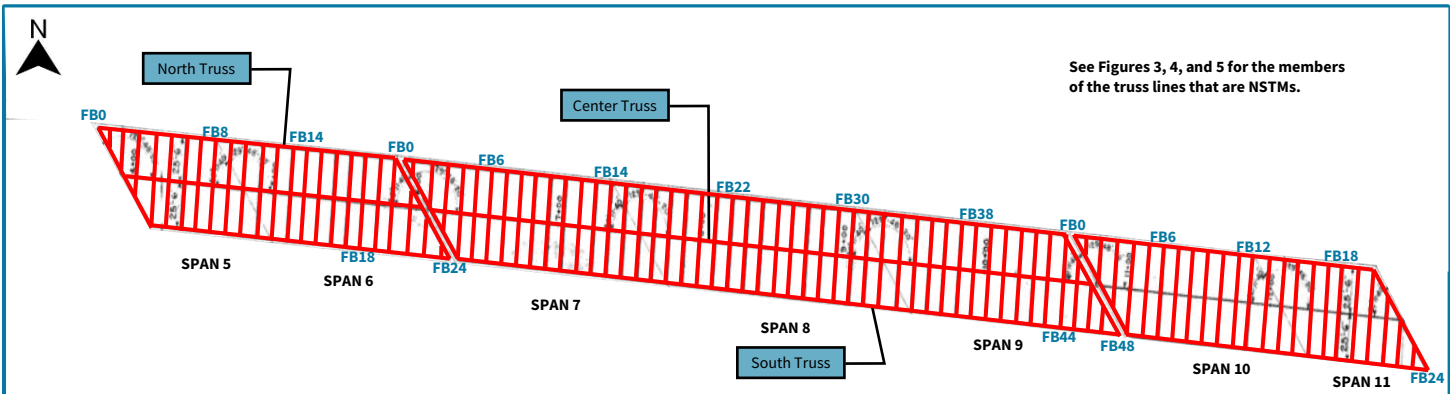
HAM-50-2180N Bridge Nomenclature (Framing Plan Layout and NSTMs - Spans 5 to 11)
